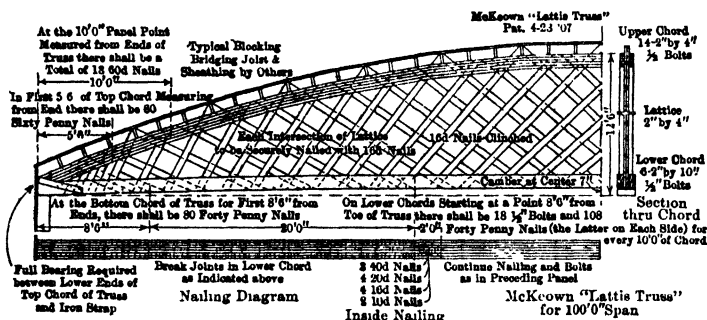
Wooden Lattice Truss with Curved Chord. McKeown Bros. Co., Chicago
